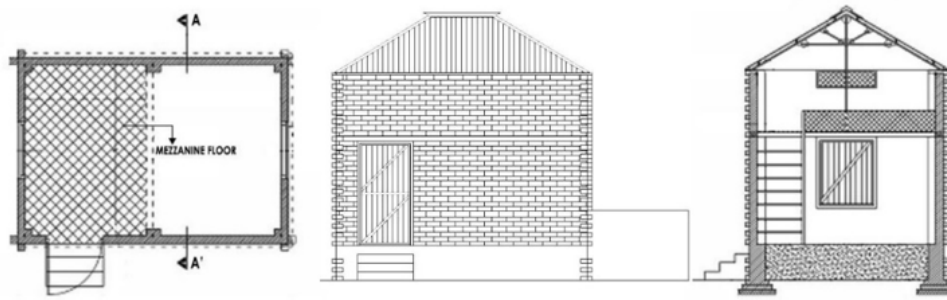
Plan, Elevation, and section of shelter projects implemented by UNDP (Source: Shelter Cluster)
